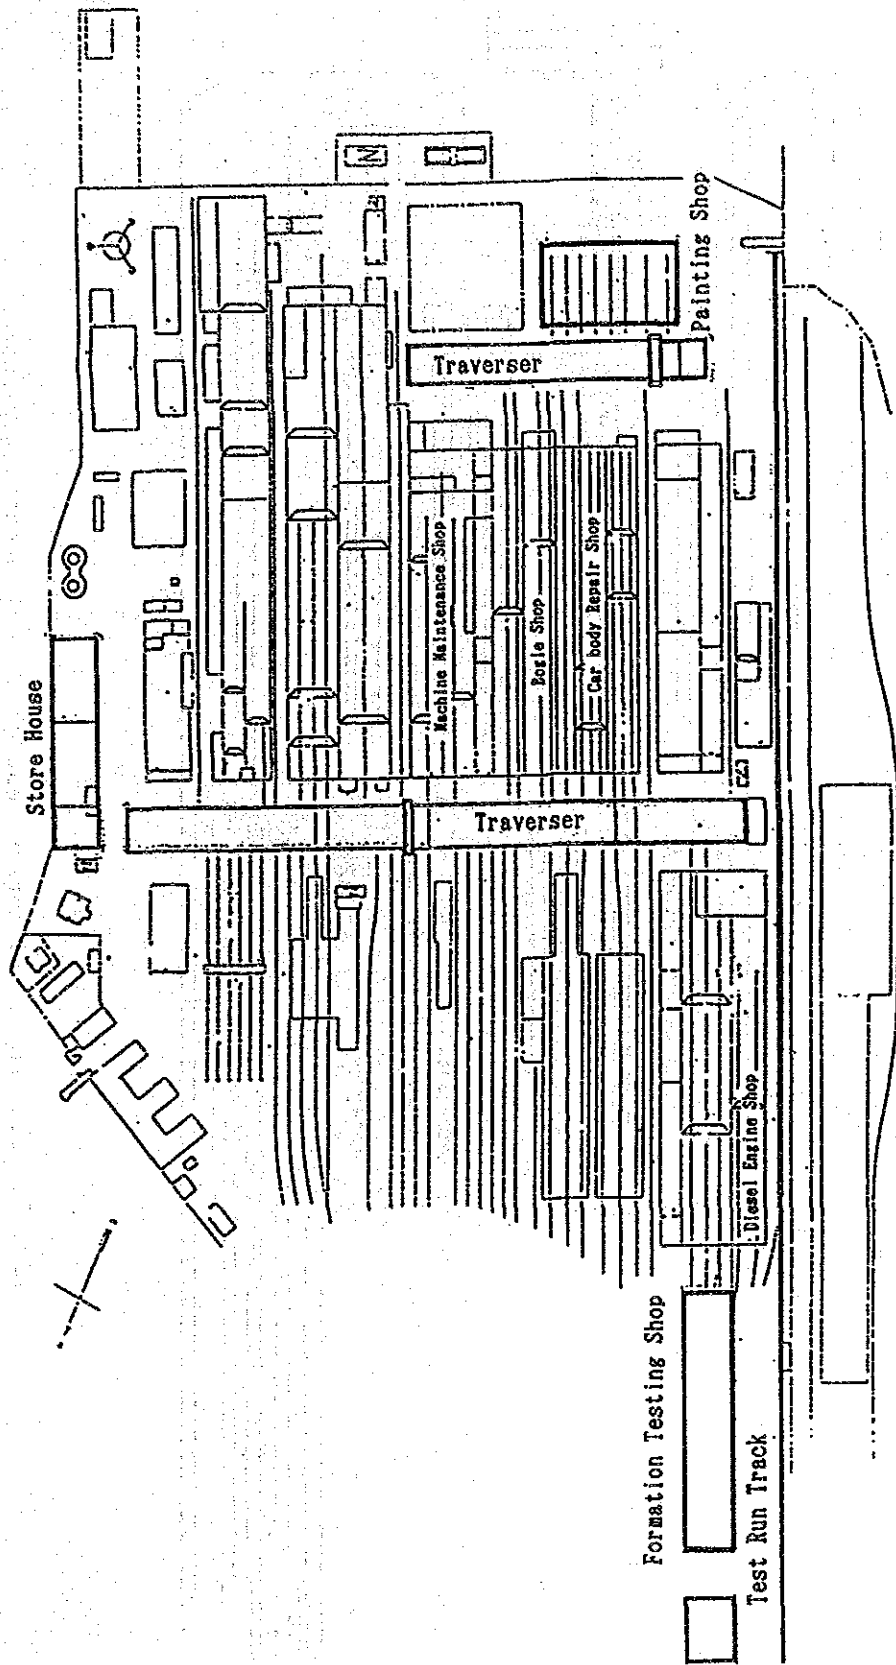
Layout of Existing Manggarai Workshop
